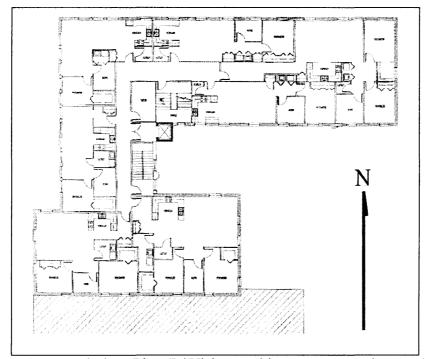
Second Floor Plan (In\Vision Architecture, November 15, 2004)
